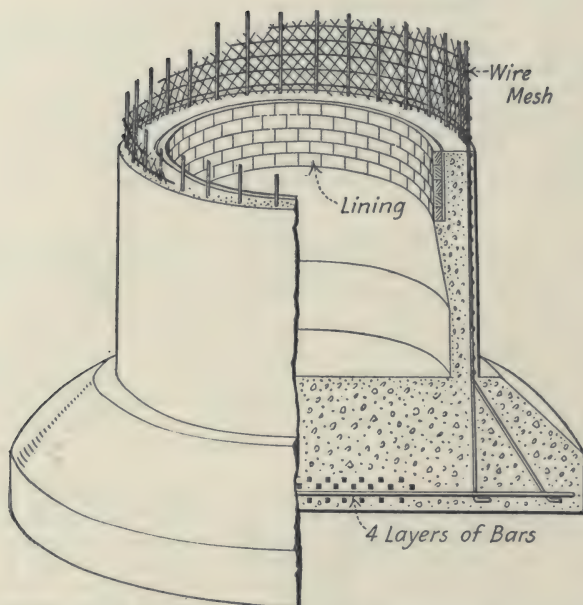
Base and Foundation of Heine Reinforced Concrete Stack.
